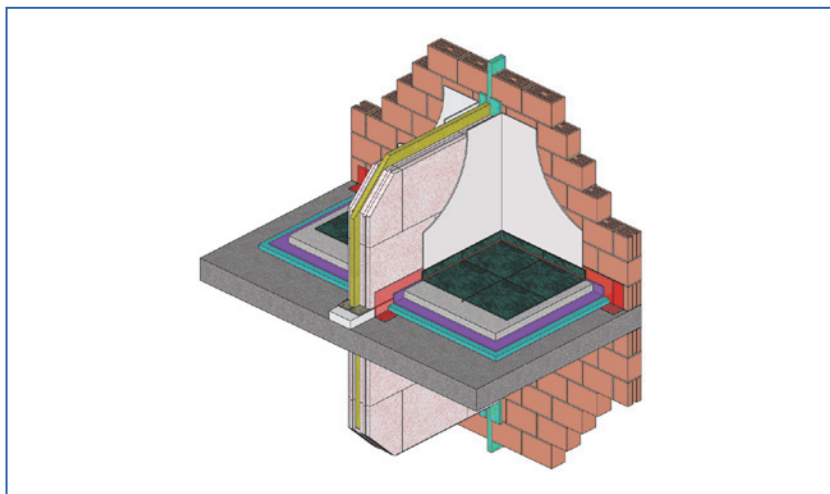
Building concepts continuous floor slabs and a party wall with non load bearing walls of gypsum blocks. [[2] - (Belgium)].
